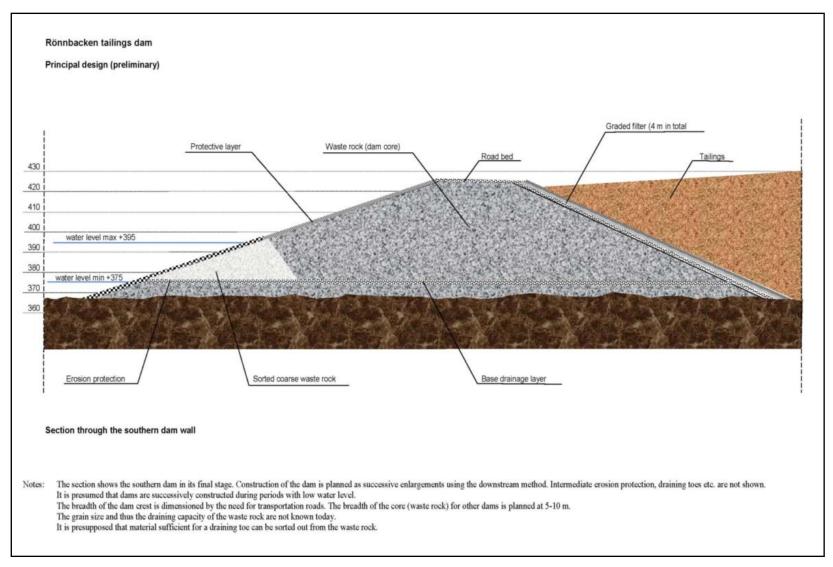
Section of the proposed Rönnbäcken TMF dam construction design
